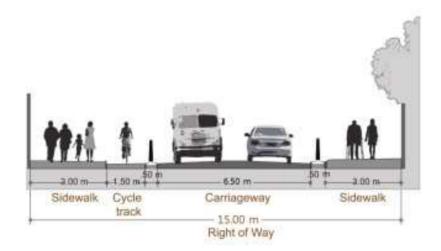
Installation standards of NMT facilities for main roads
